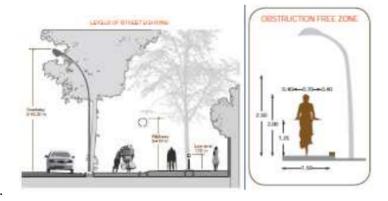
Installation standards of NMT facilities for main roads
